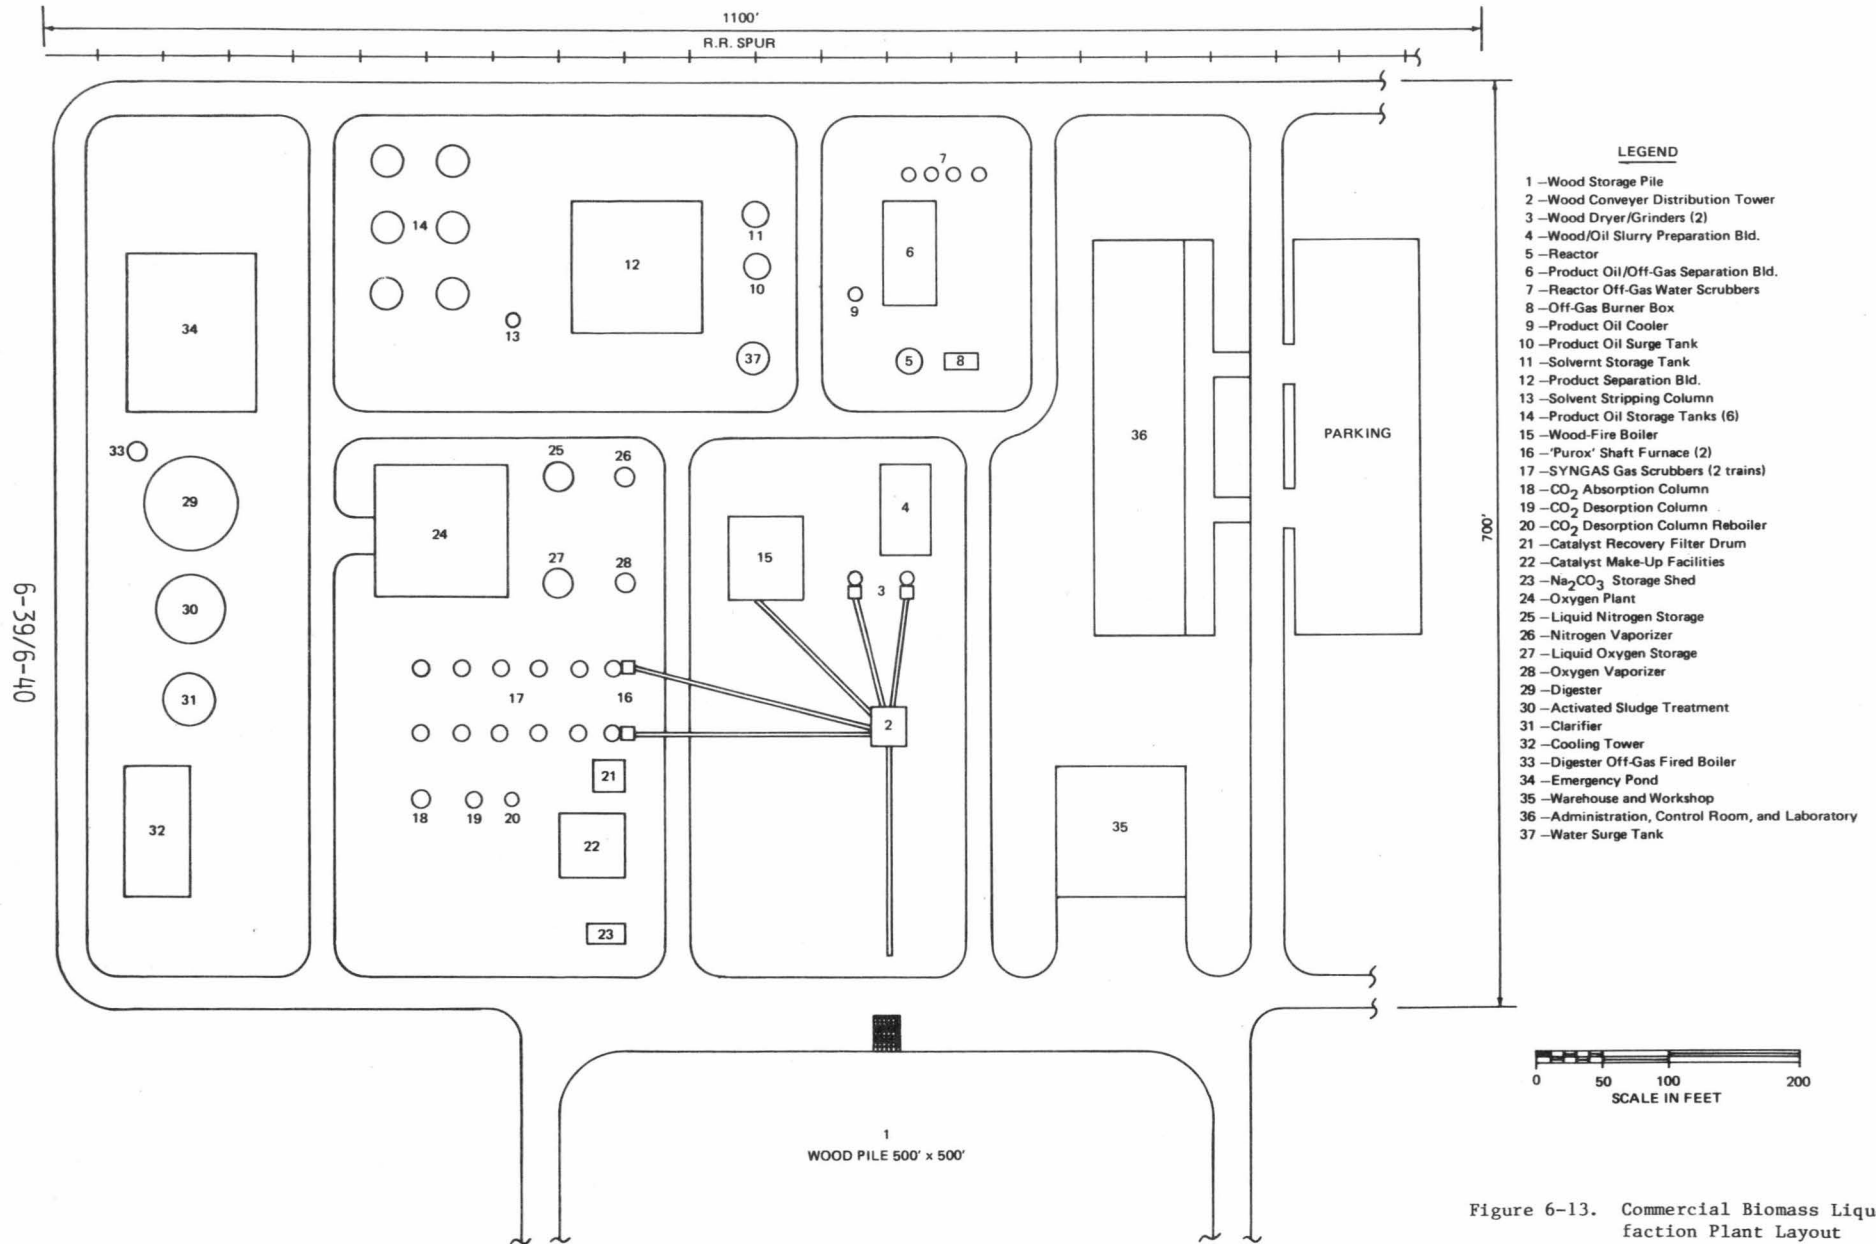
Commercial Biomass Liquefaction Plant Layout
